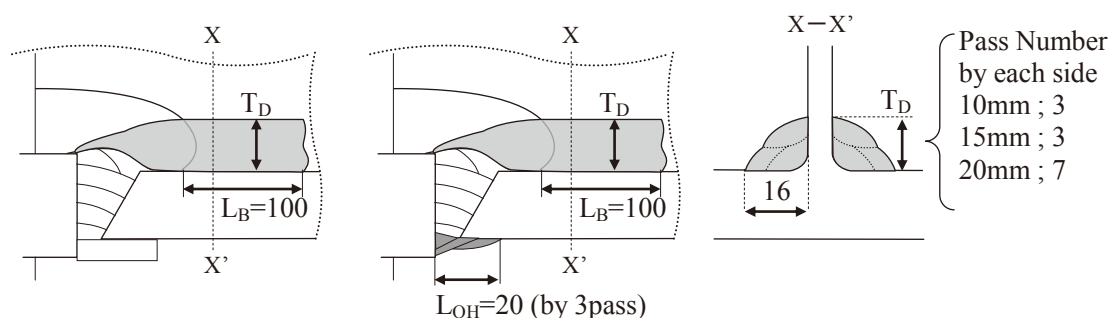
Dimension of the overlay welding around toes of scallops and the overlay by overhead welding without backing plate of the Fig. 5.1(b) and Fig. 5.1(c) types
